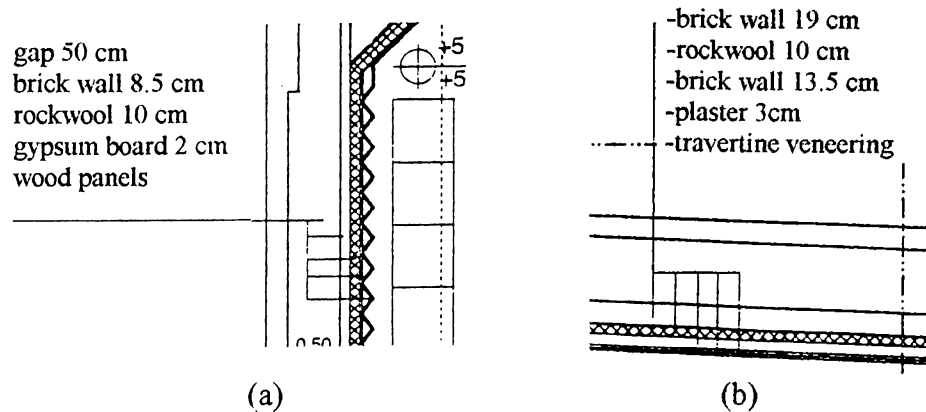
The materials and their application (a) for the back wall, (b) side walls of the main floor of the concert hall.
